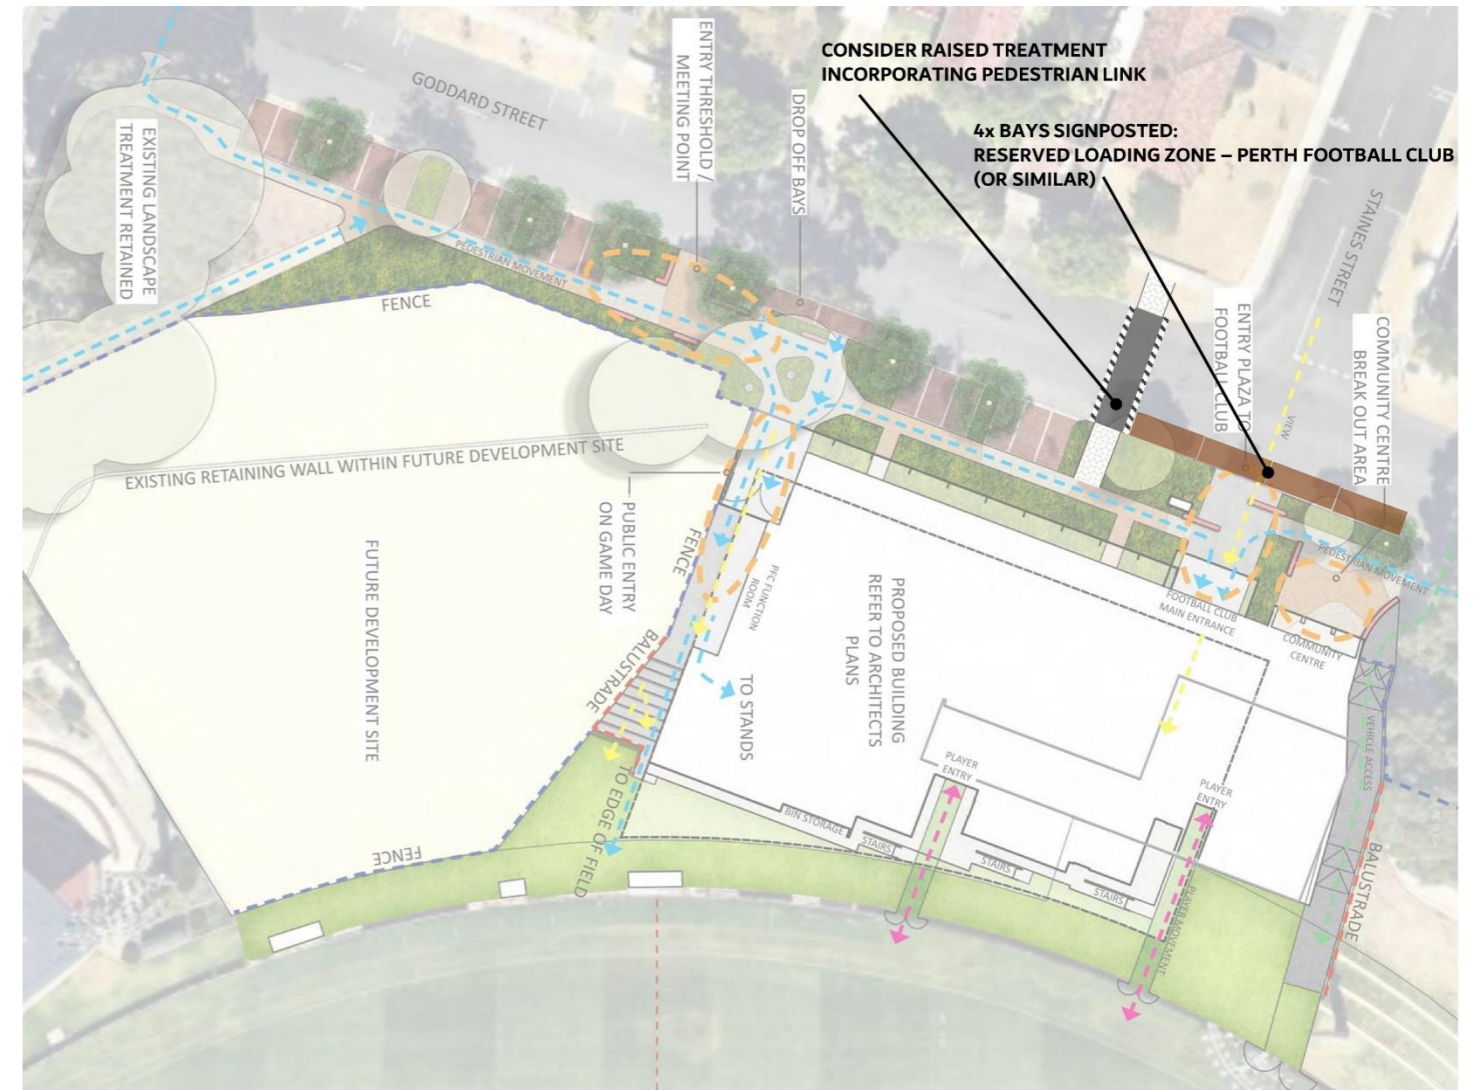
Proposed service vehicle arrangements (base plan source: Emerge Associates, Rev E dated 06/06/23)
